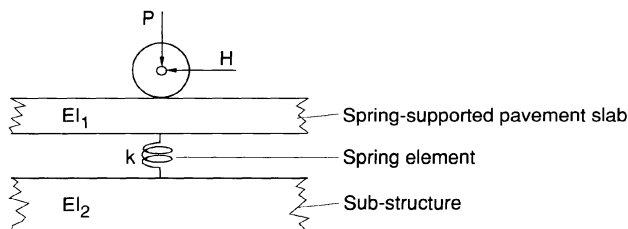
Simplified system of a spring supported slab on a sub-structure [4.2]
